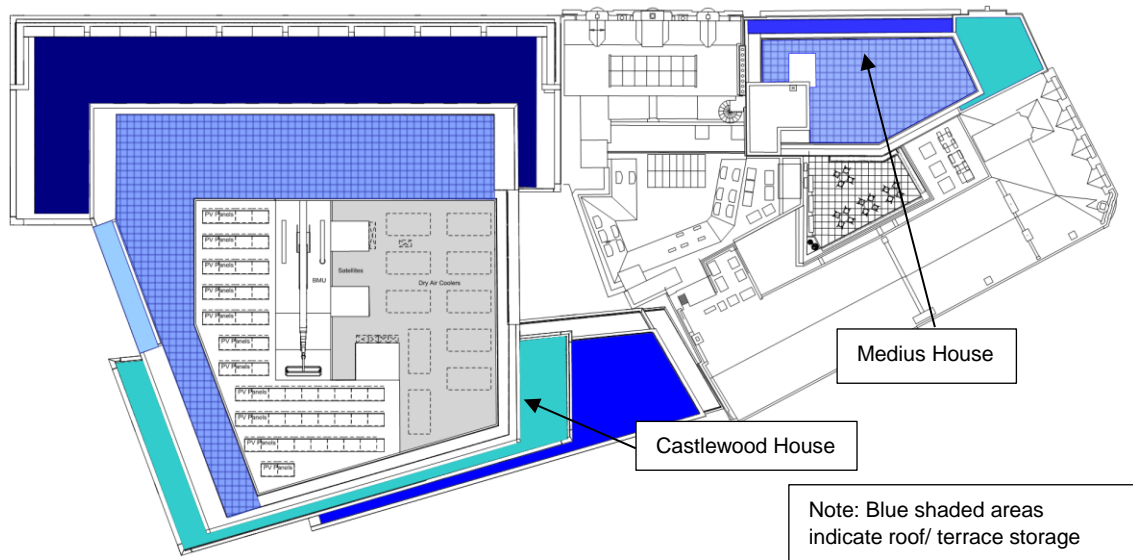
PROPOSED ROOF & TERRACE LEVEL ATTENUATION PLAN
